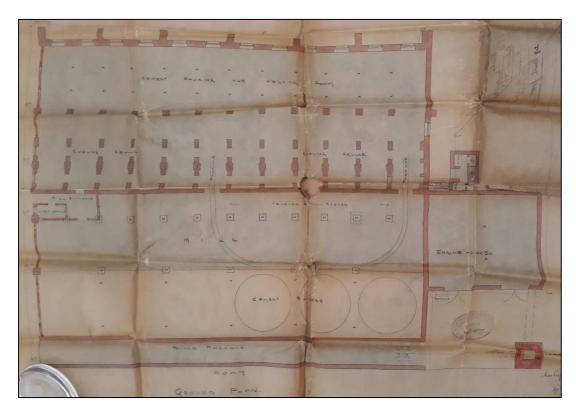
Ground plan of alabaster factory, 1888 (Asset 36)
